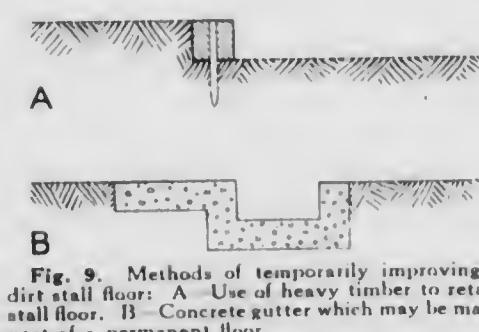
Methods of temporarily improving a dirt stall floor: A—Use of heavy timber to retain stall floor. B—Concrete gutter which may be made part of a permanent floor.
